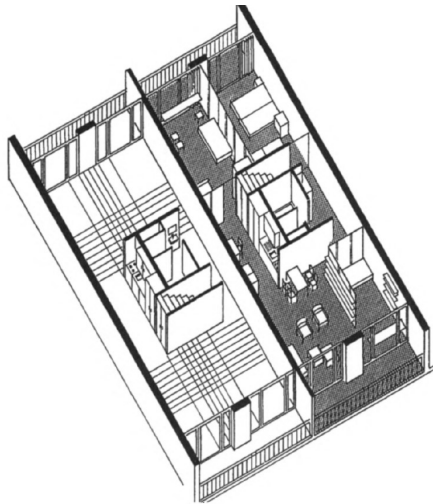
Site and apartment plan of Molenvliet Project (Right)
